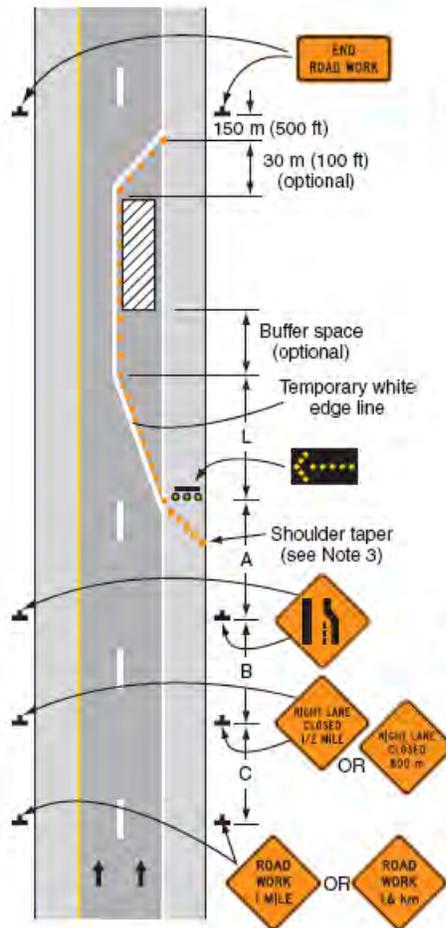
Stationary lane closure on divided highway (typical application 33) (FHWA 2009c).
